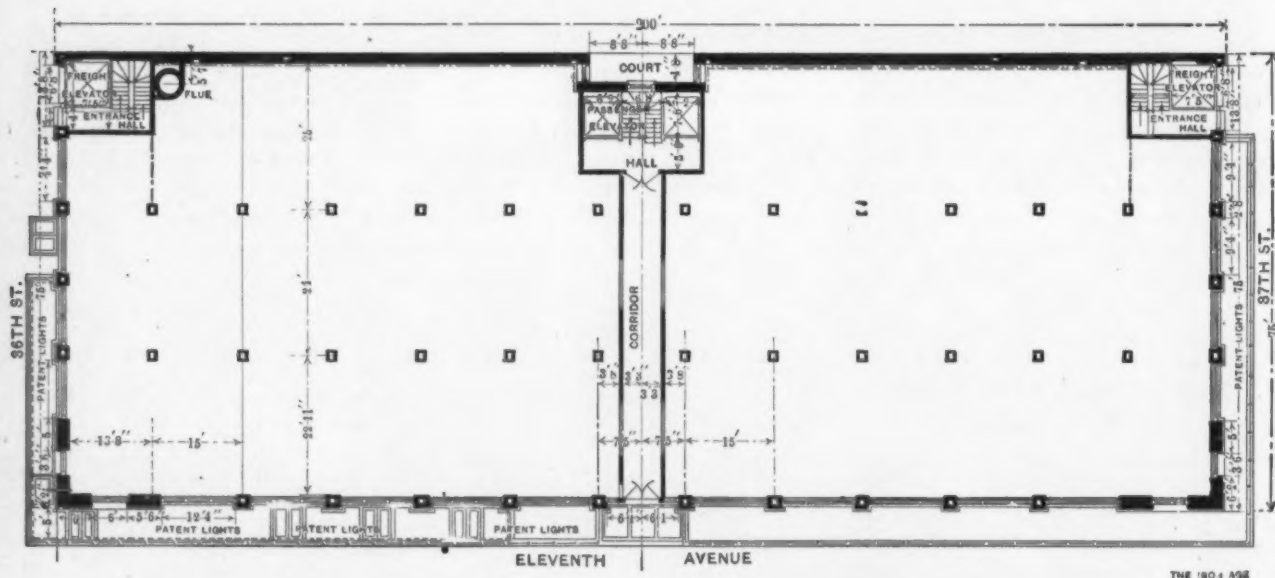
Floor Plan, Showing the Location of the Main Entrance, Corridor, Halls, Elevators, &c.
